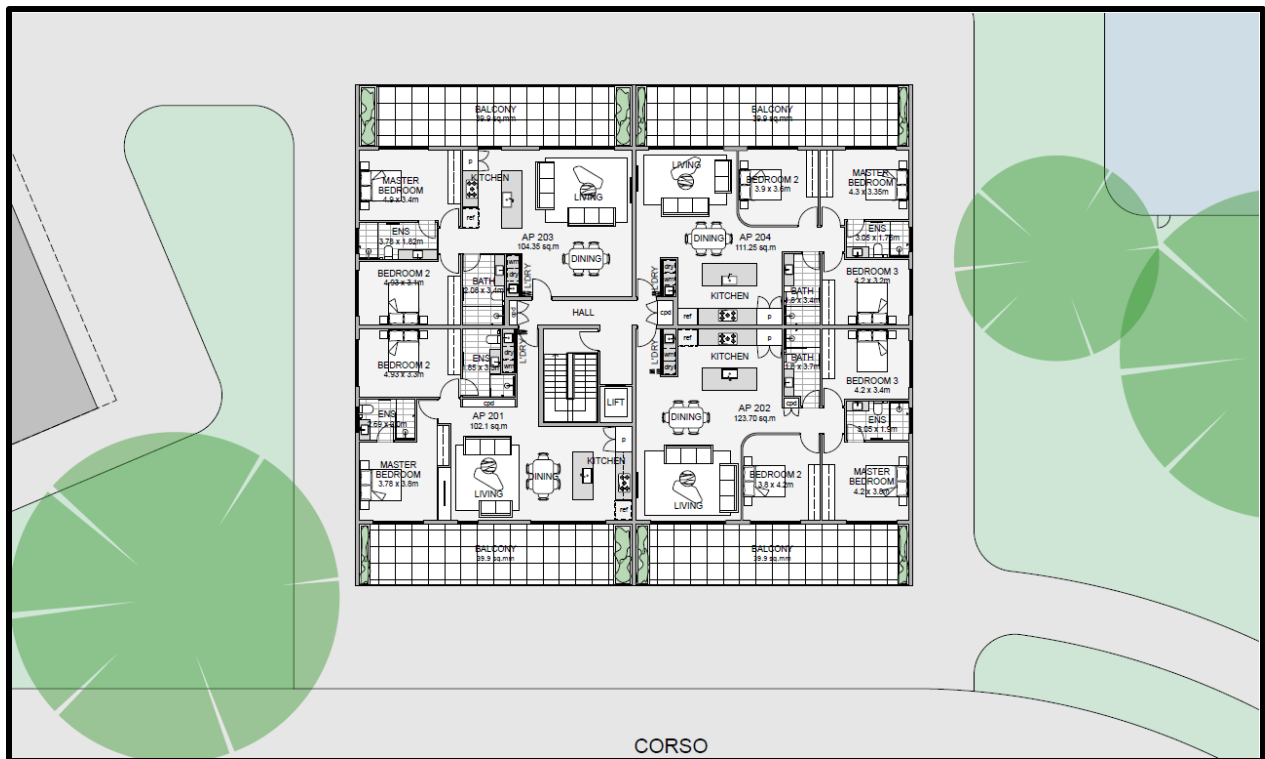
Typical Shop Top Housing Second Floor (Source: Robert Harwood Architects)
